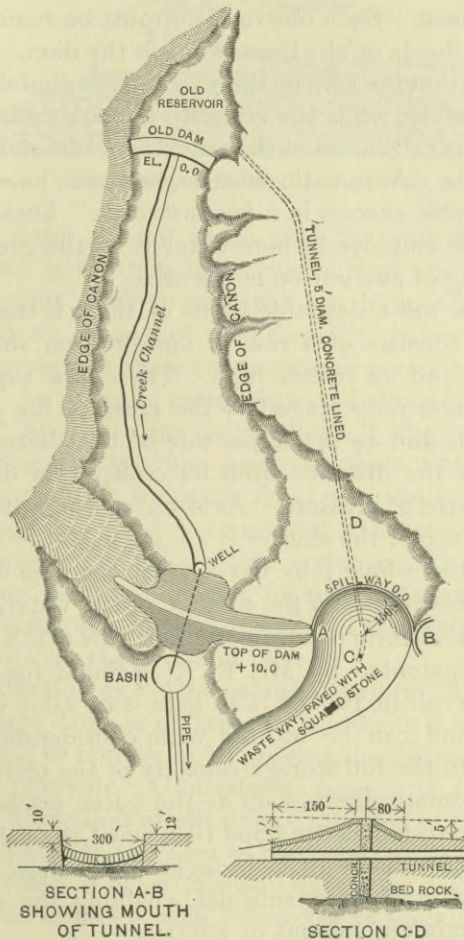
PLAN OF SANTA FÉ RESERVOIR, SHOWING ARRANGEMENT OF WASTE-WAY AND CROSS-SECTION OF WASTE-WEIR.
